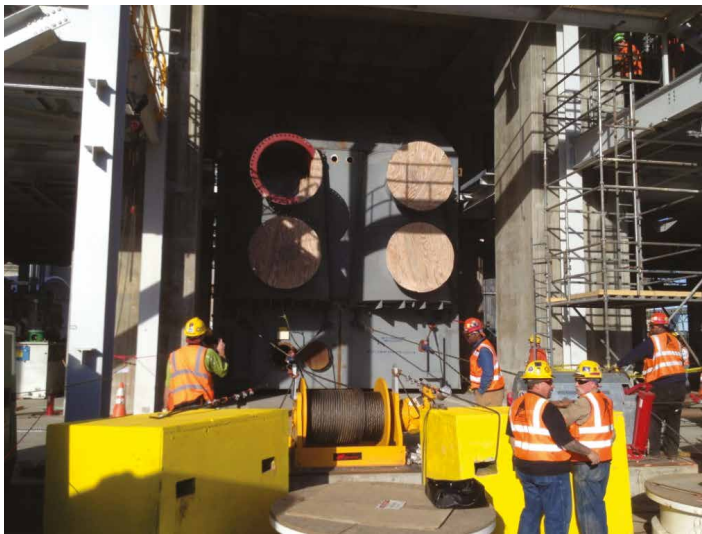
Condenser installation utilizing air winches and heavy equipment rollers (1)
